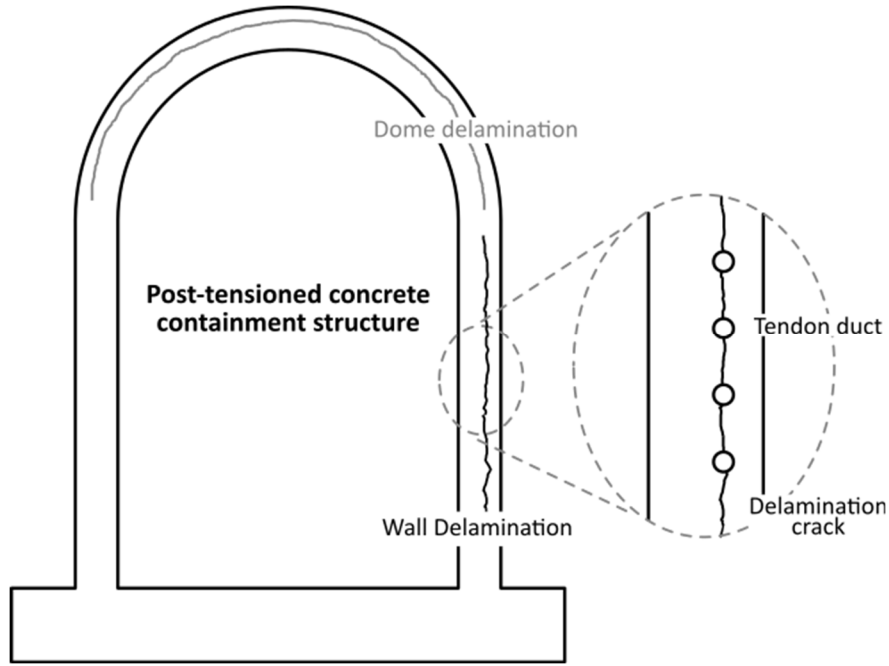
Delamination crack in a post-tensioned concrete containment structure
